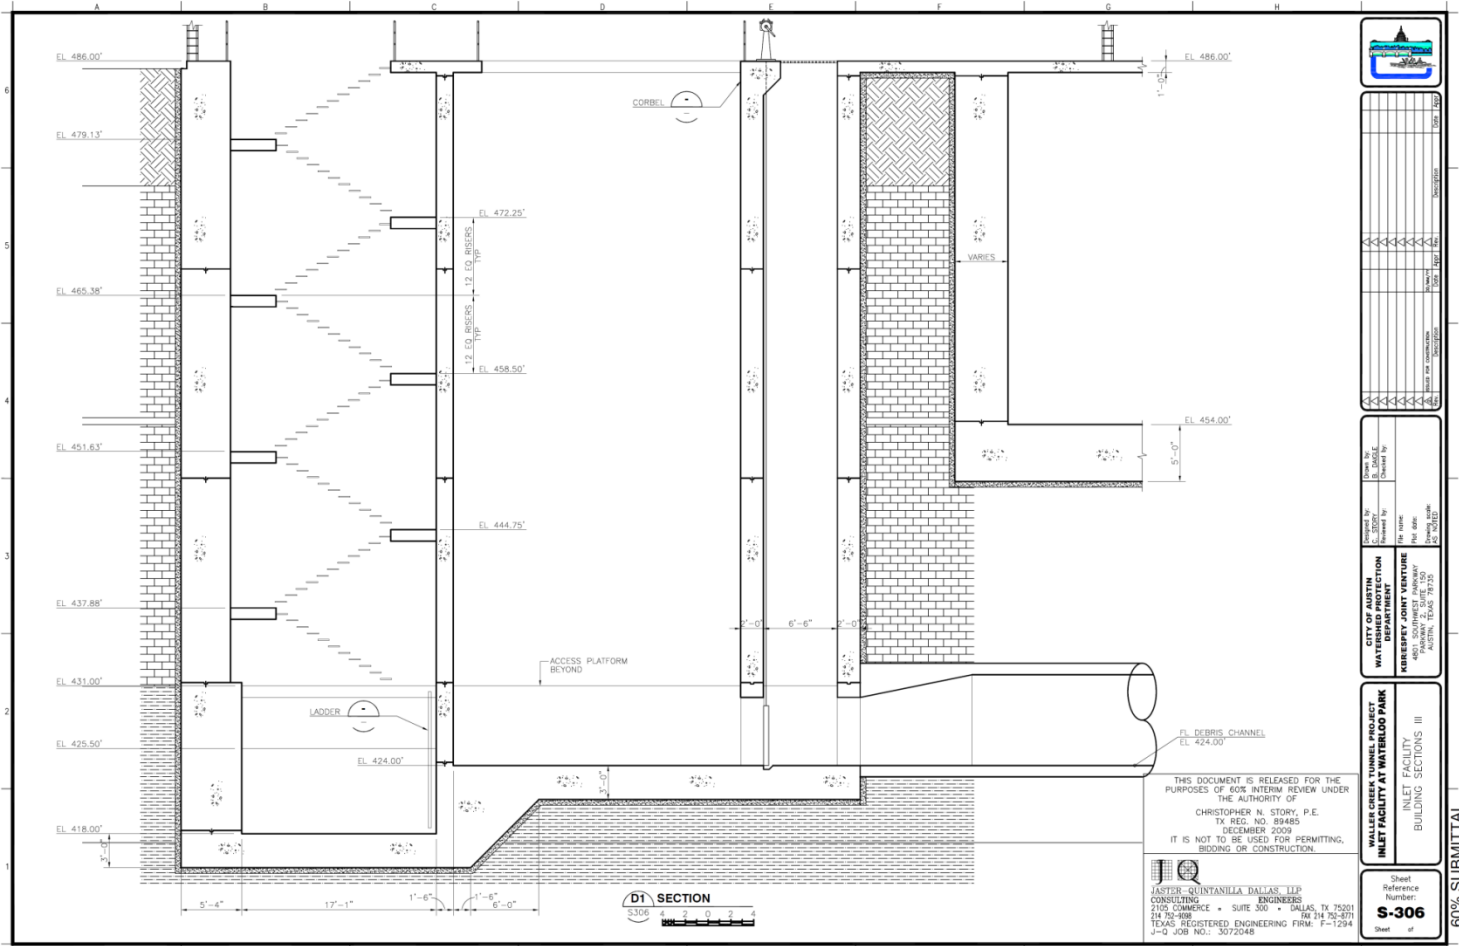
Waller Creek Tunnel Project; Morning Glory Spillway – Section
